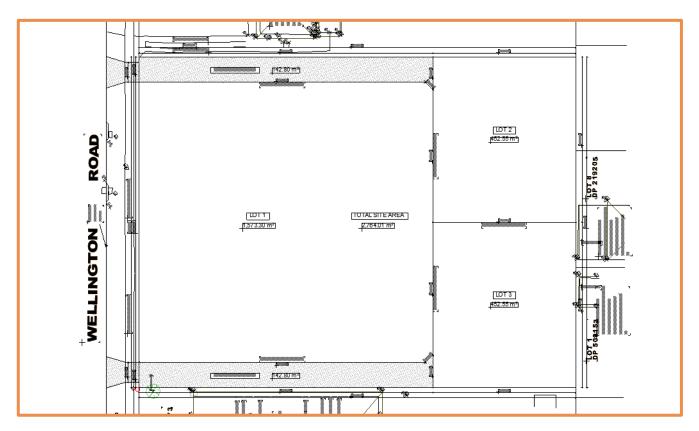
Submitted Subdivision Plan (Source: Campbell Hill Group)
